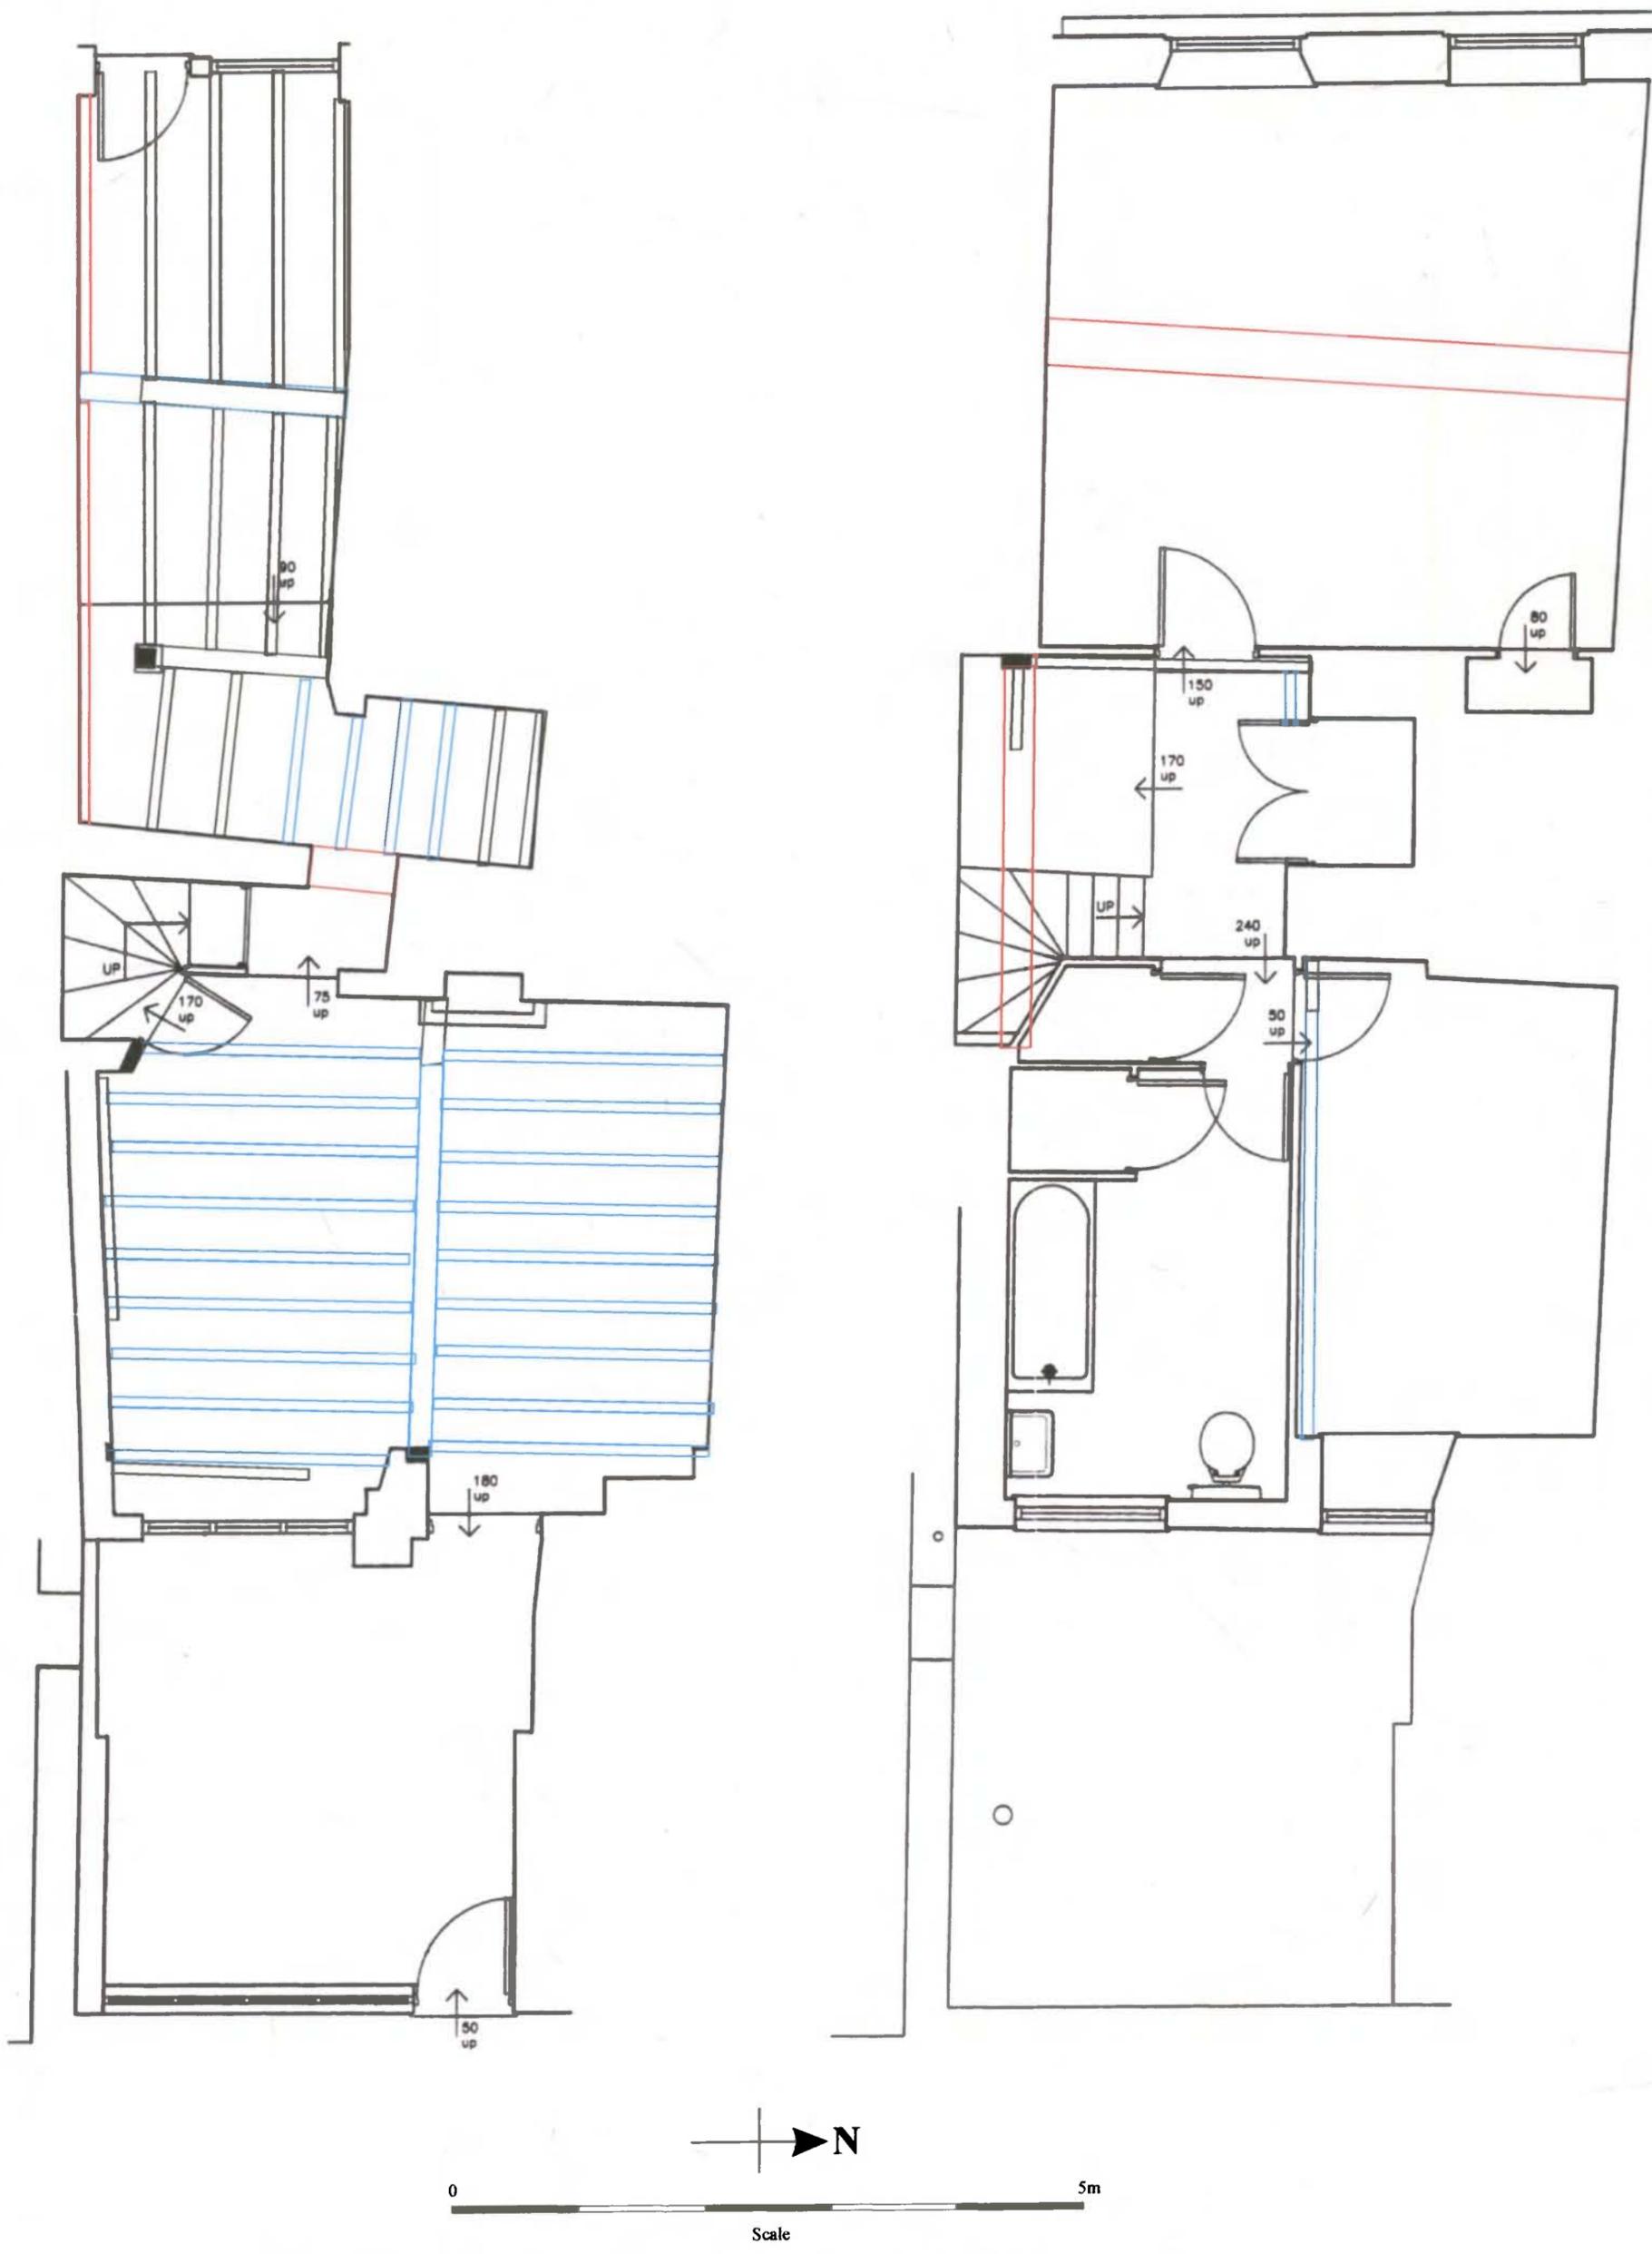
Floor plans of No.8, St. Lawrence Street, showing the arrangement of the timber frame within the building. Original timbers are shown in black: posts solid, beams open; replacement beams and joists are shown in blue, while false beams and boxed beams are shown in red. Scale 1:50.
